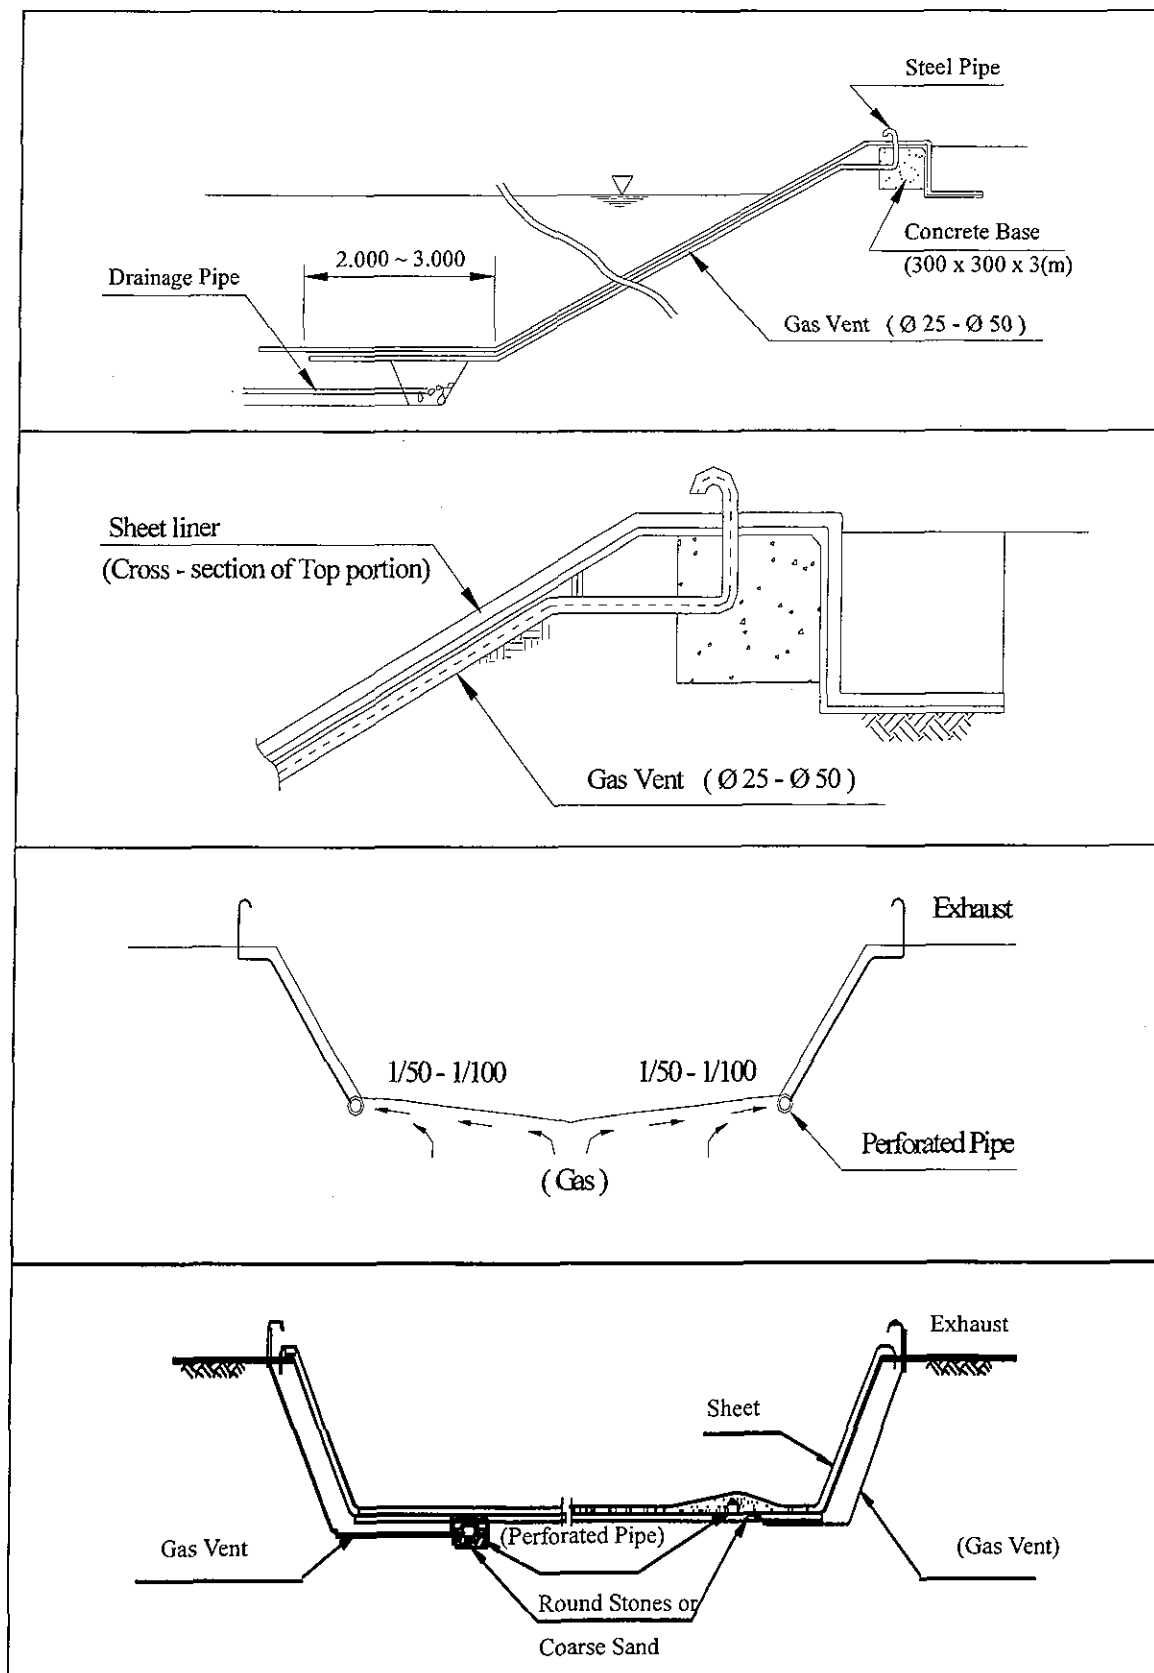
Installation of Gas Vent in Landfill with Liner Facility
